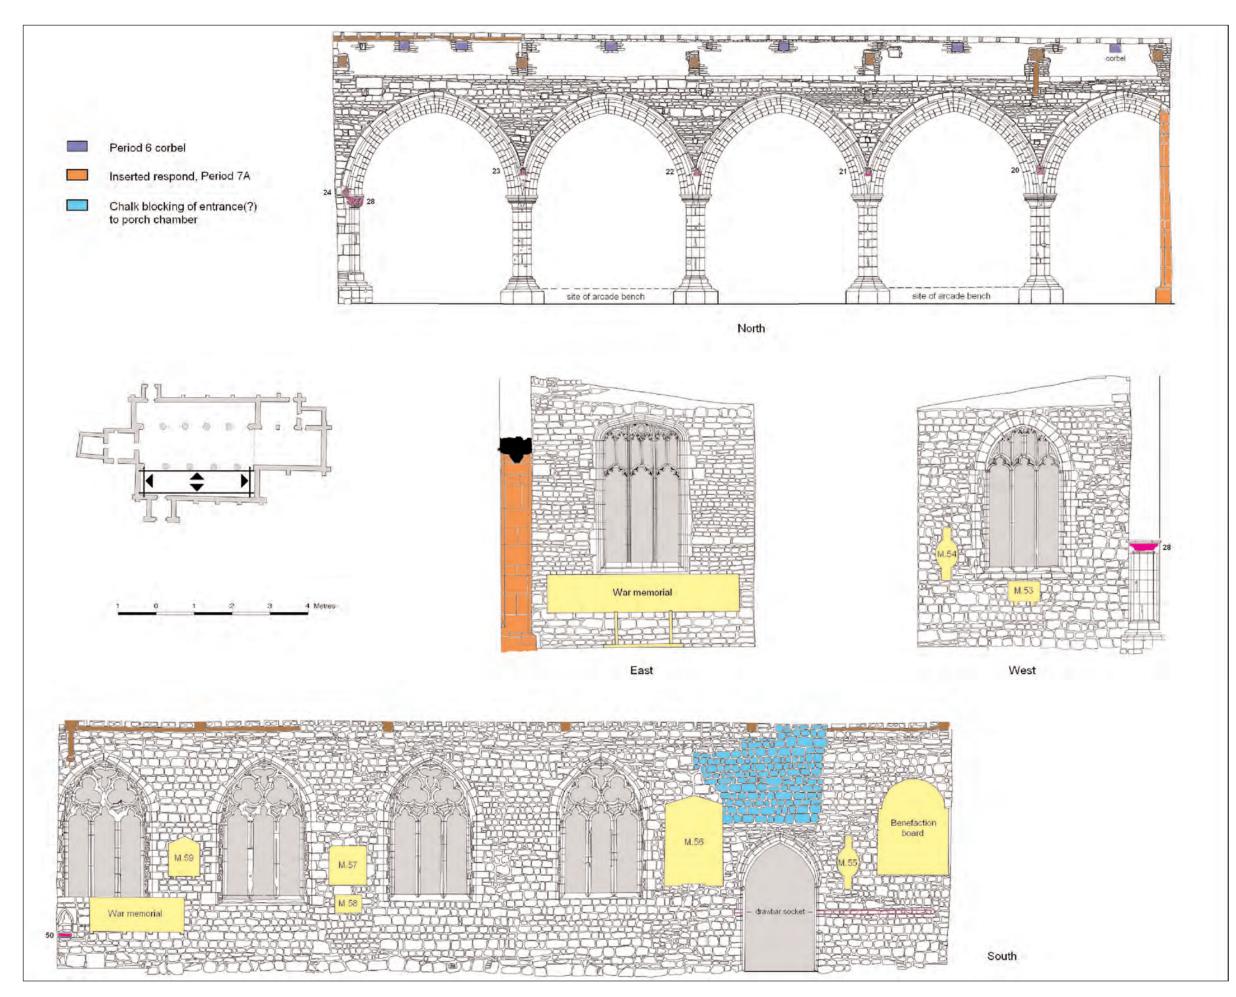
South aisle and arcade. Internal elevations, 1984. The positions of wall-mounted memorials are also shown (M.53–M.59). Scale 1:100. Drawing: Simon Hayfield
